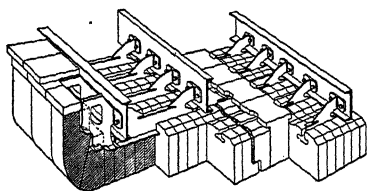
Suspended arch, showing both the horizontal arch and nose construction.
